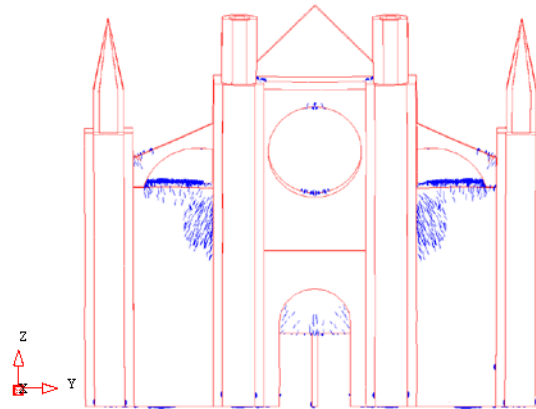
Crack pattern (in blue) in facade after an earthquake in +Y direction
